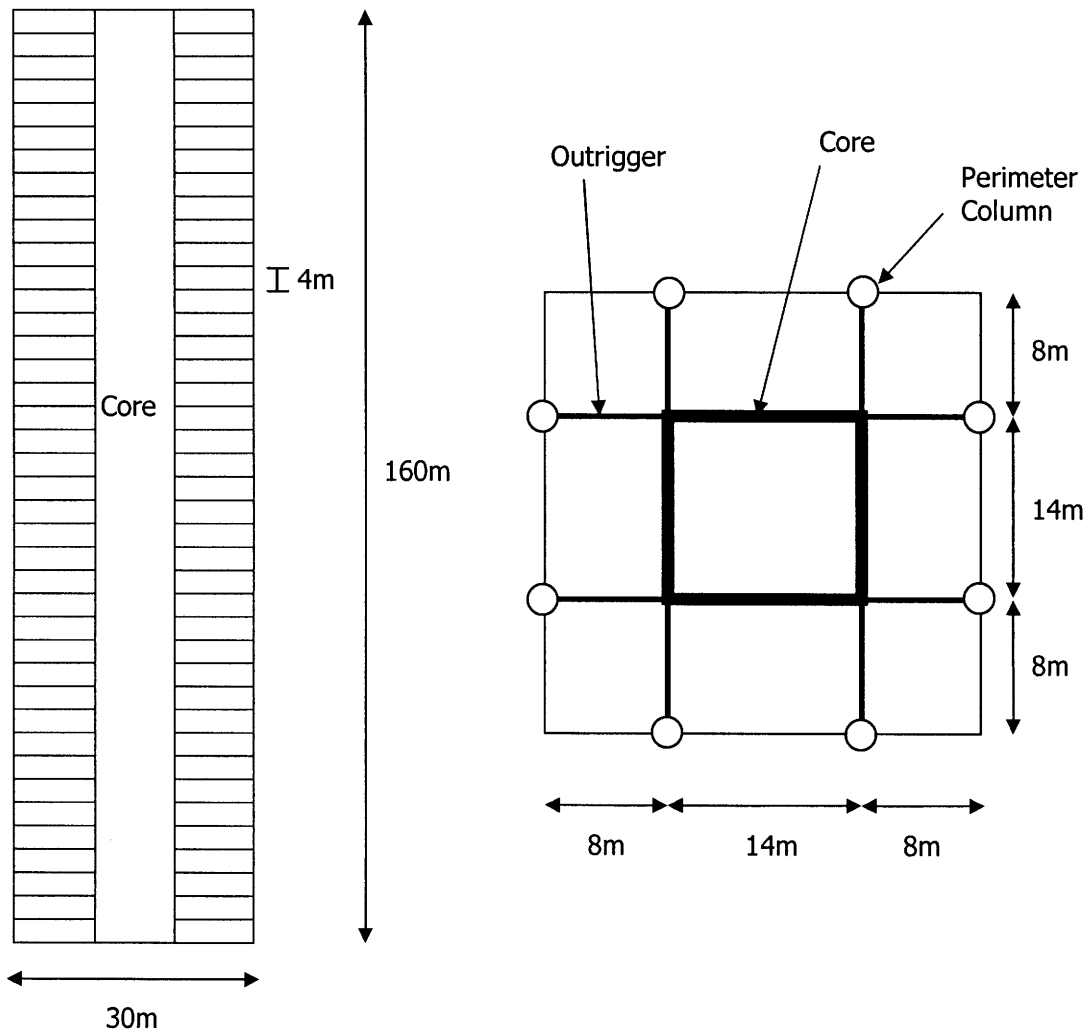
Buildings dimensions in elevation (left) and plan (right)
